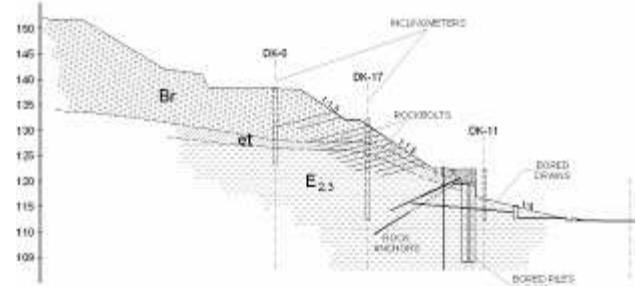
Cross-section of landslide with anchored pile-wall solution.
